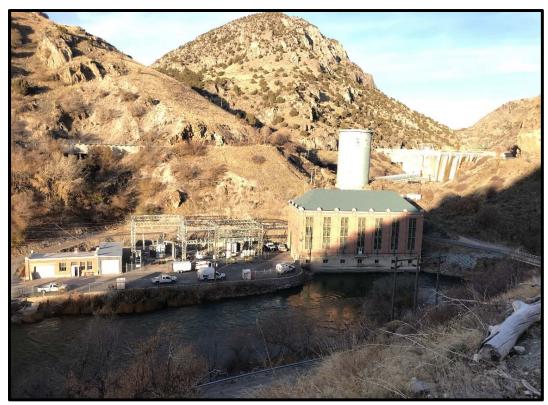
CUTLER POWERHOUSE AND SUBSTATION (NOT A PROJECT FEATURE), LOOKING UPSTREAM, CUTLER DAM IN THE BACKGROUND
